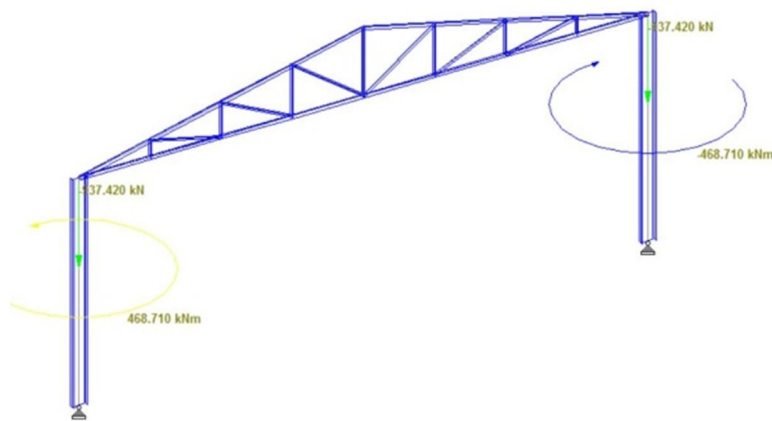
Factored load and couple moment acting on supporting columns of conventional steel frame
